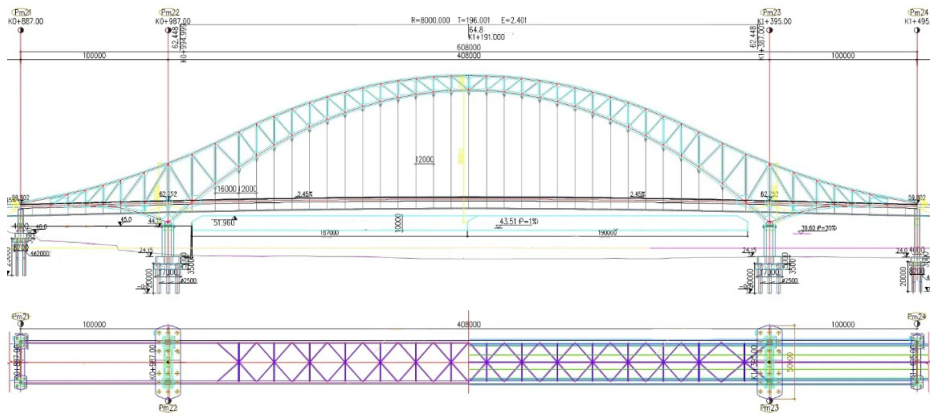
Elevation and plan view of the Qingshuitang Bridge
